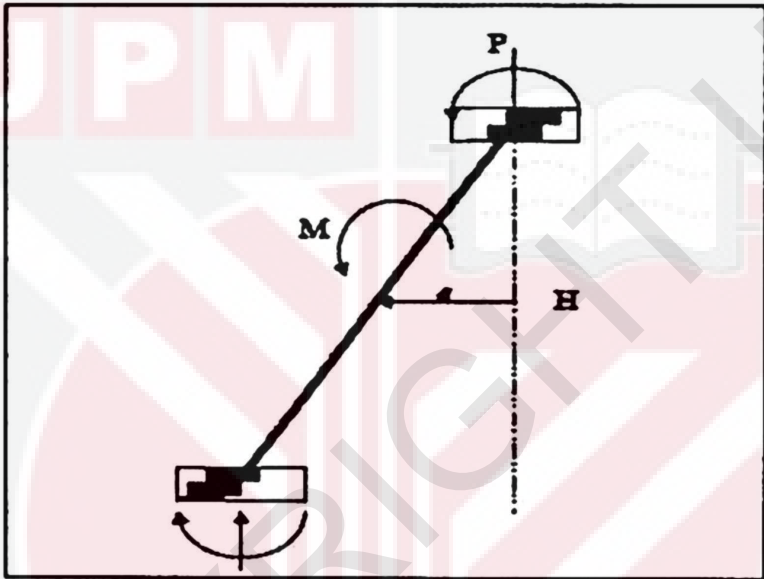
Slanted Column Subjected to Eccentric Axial Load
